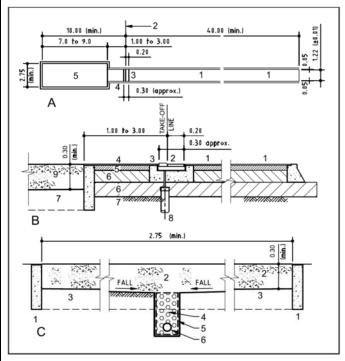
Facility for the Long Jump (Dimensions in m)
